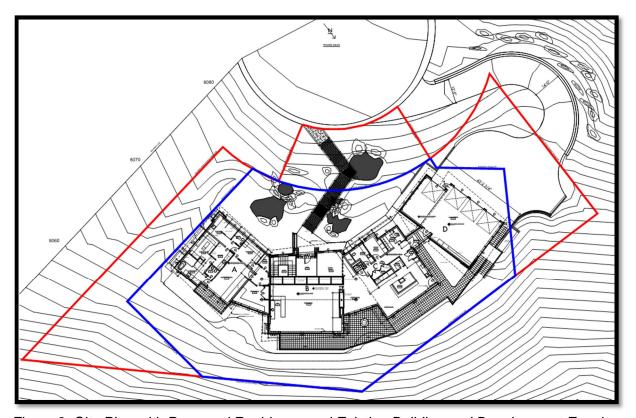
Site Plan with Proposed Residence and Existing Building and Development Envelopes
